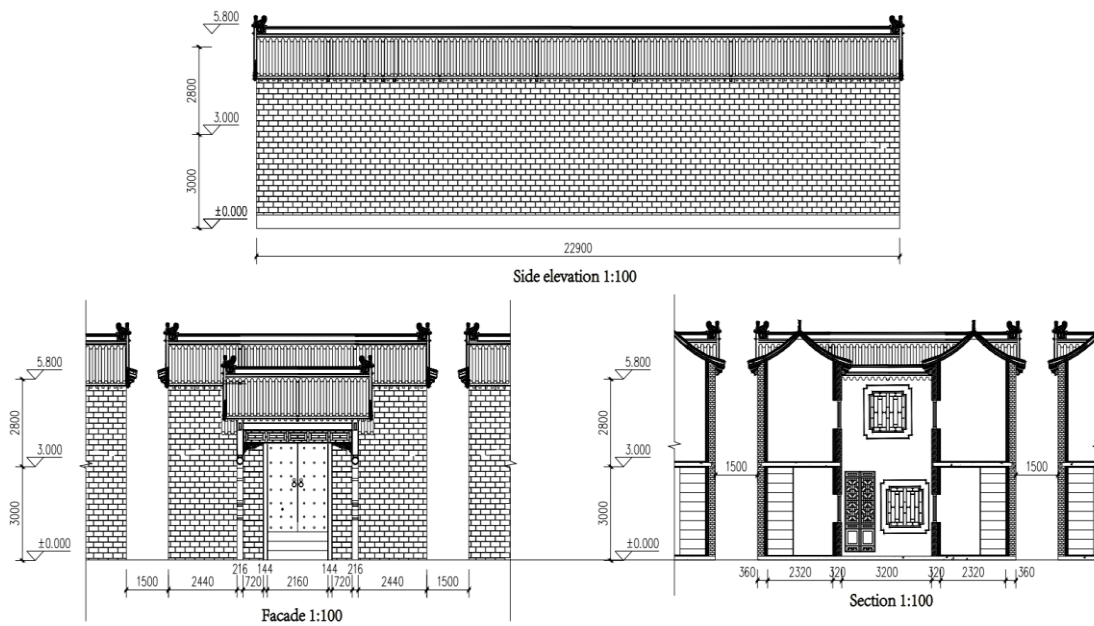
The front elevation, side elevation and cross-sectional view of the study case.
